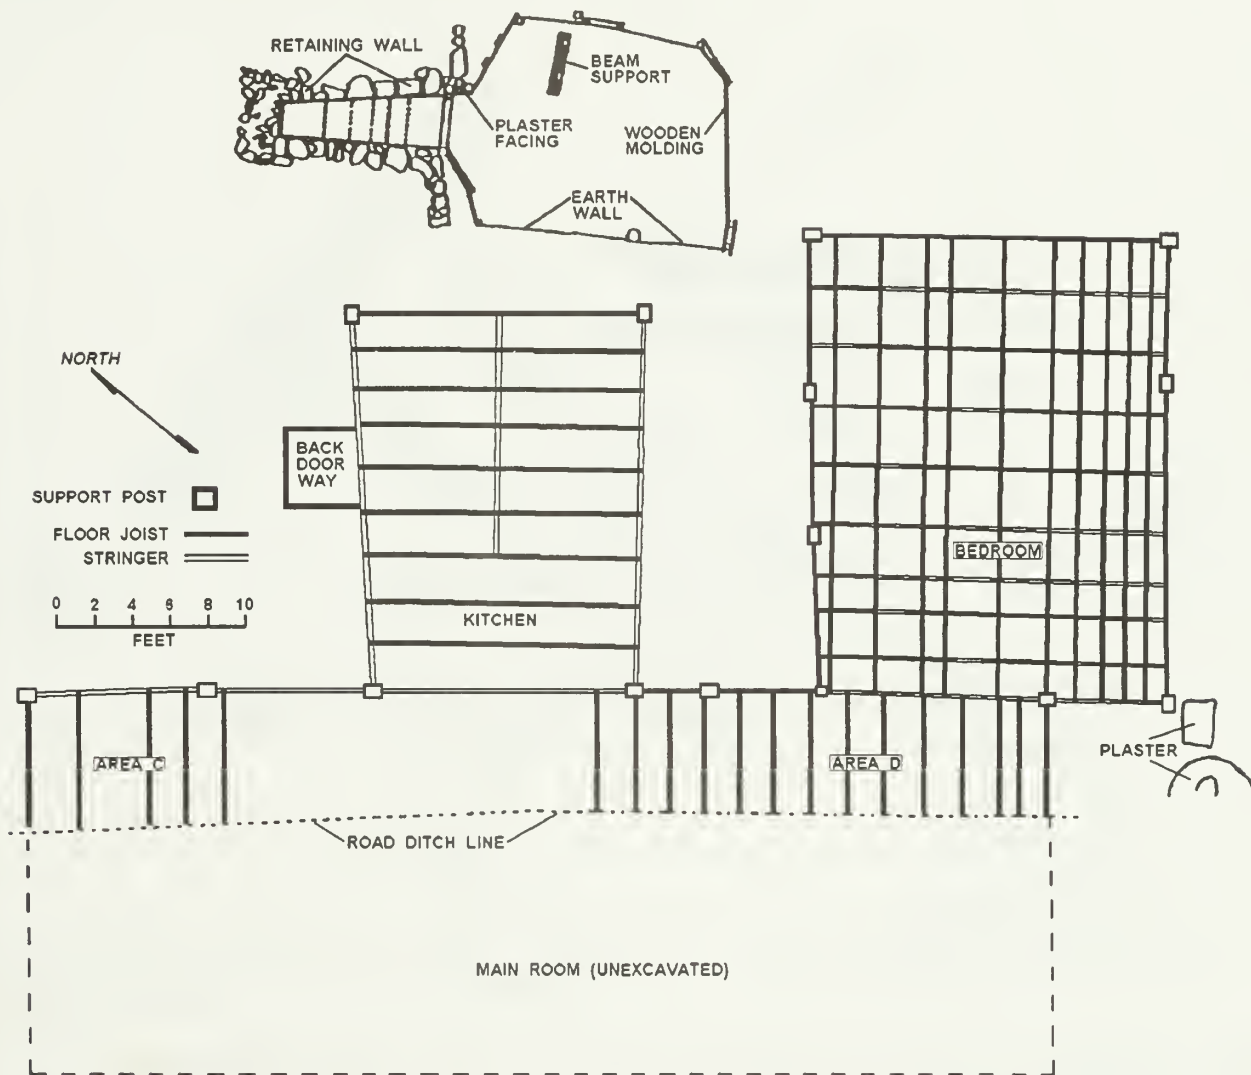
Reconstructed floor plan of the Rustic Hotel, based on archeological excavations (from Ehrenhard 1971).
